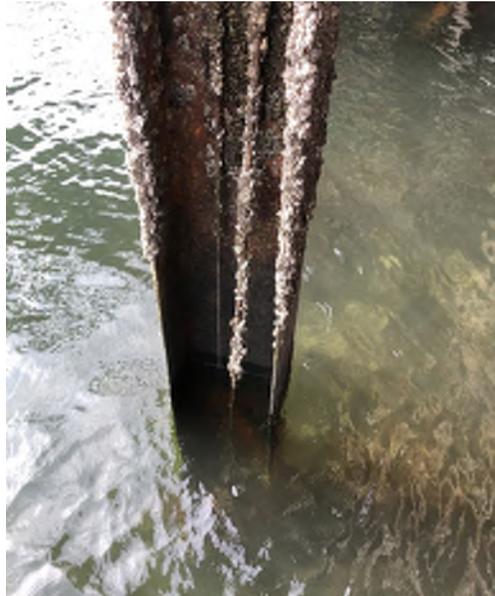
Steel H-pile with no remaining timber or concrete jacketing. Taken by ASC on 10/22/2020 at 11:10AM.
